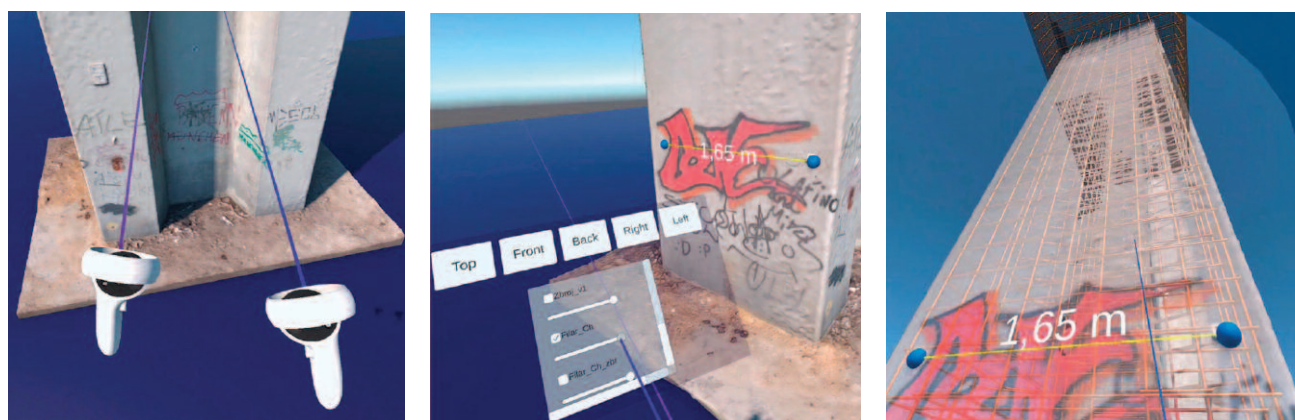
Pier inspection in the VR environment developed in Unity
